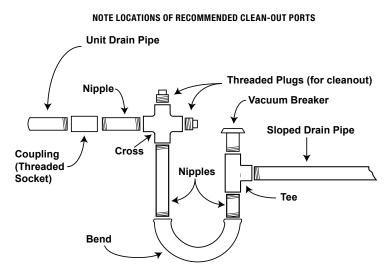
TYPICAL DRAIN TRAP CONSTRUCTION
